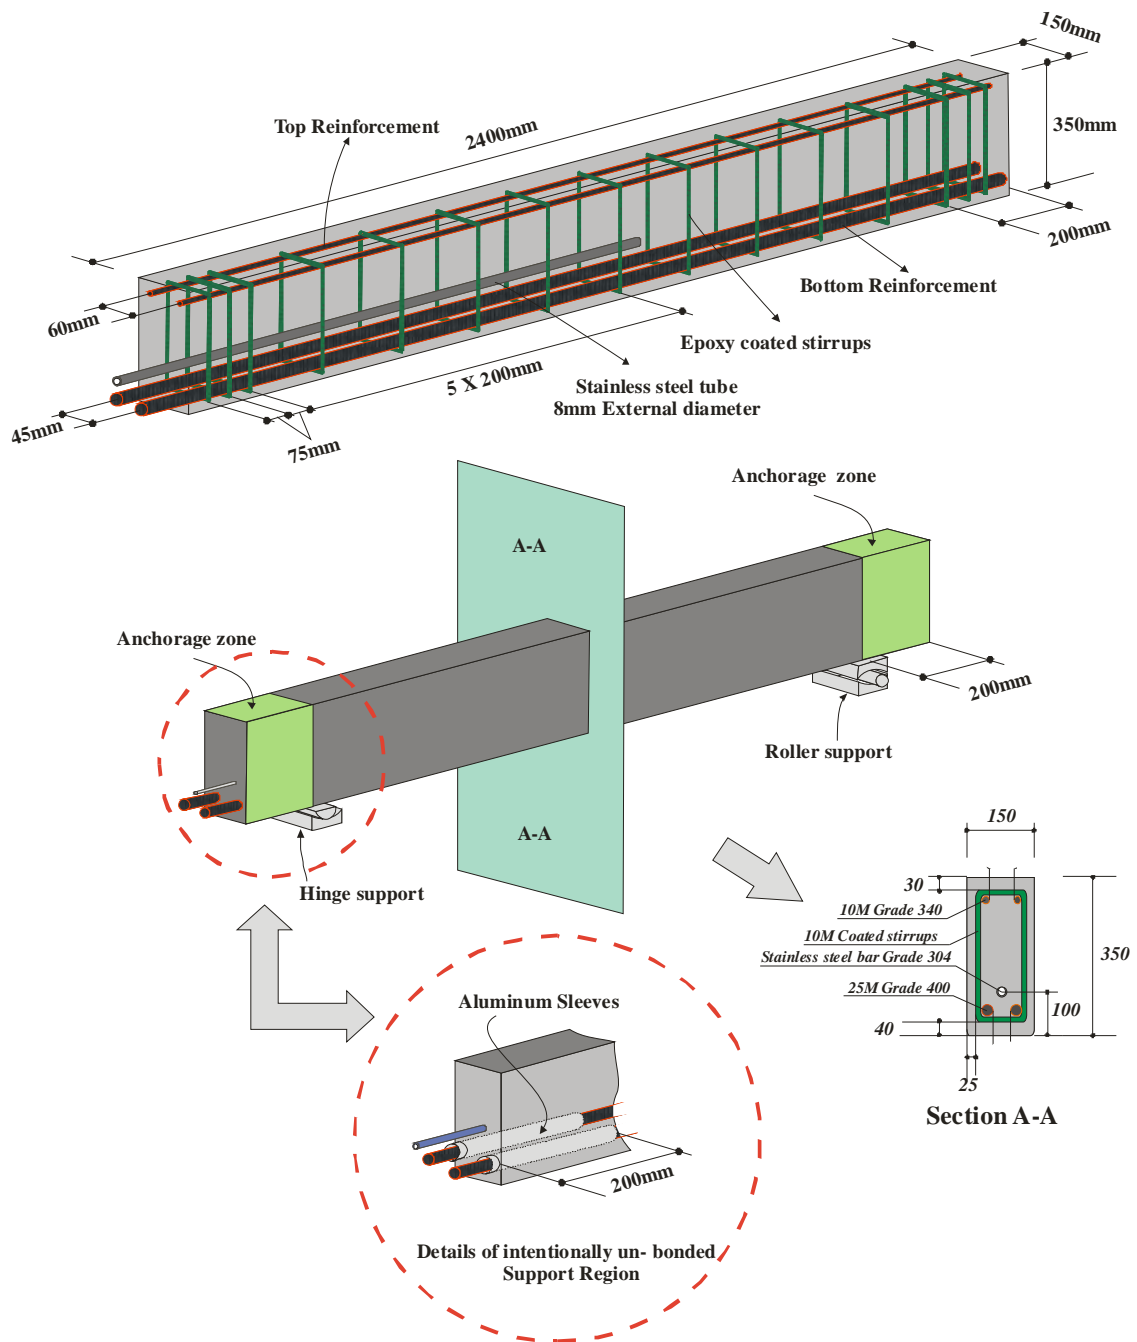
Specimen configuration and reinforcement layout (all dimensions in millimeters)
